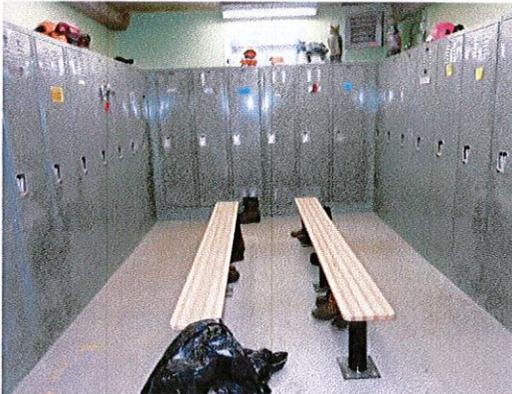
A new locker room area was created. Add an accessible bench (42" min x 20-24") with a back (or positioned against the wall).
